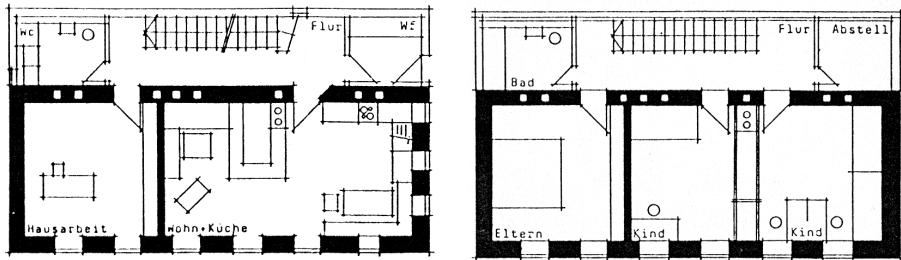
Ground Floor and Upper Floor Plans of a Passive House, Germany, Architect: Johannes Brucker (Kleiner (ed.), 1995: 82-83)
